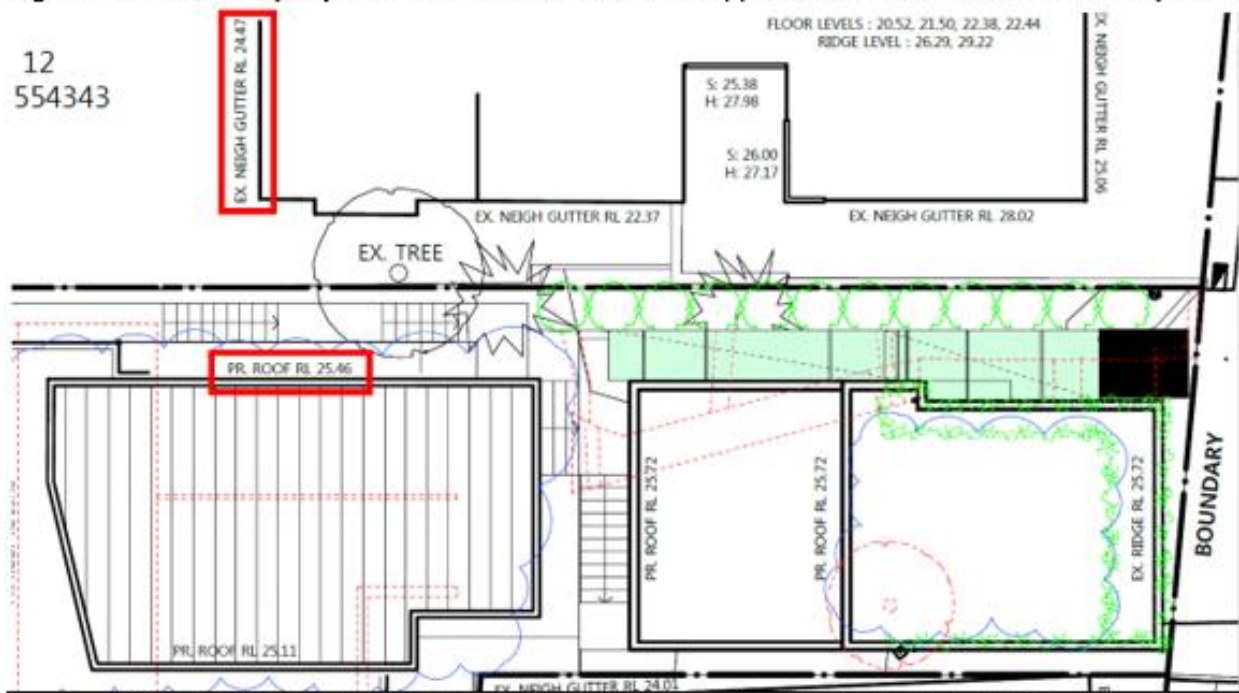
Roof plan with RL of gutter and RL of roof of upper level addition.
